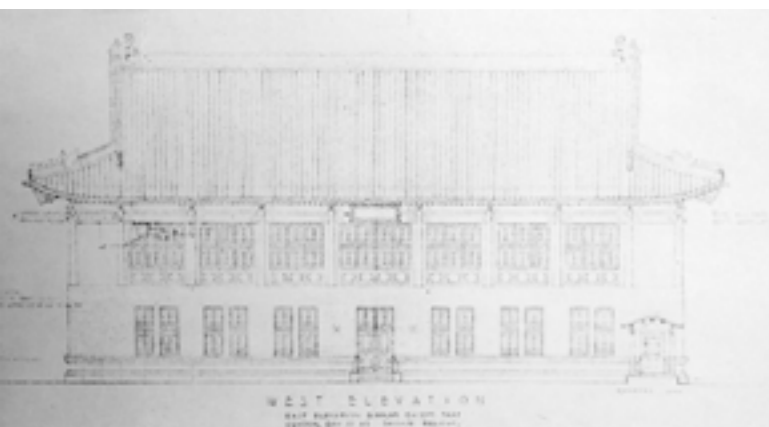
Second solution: double-height columns with spandrel panels. Henry Killam Murphy Architect, Library Building, Yenching University, 1924 (Talbot F. Hamlin Papers)
